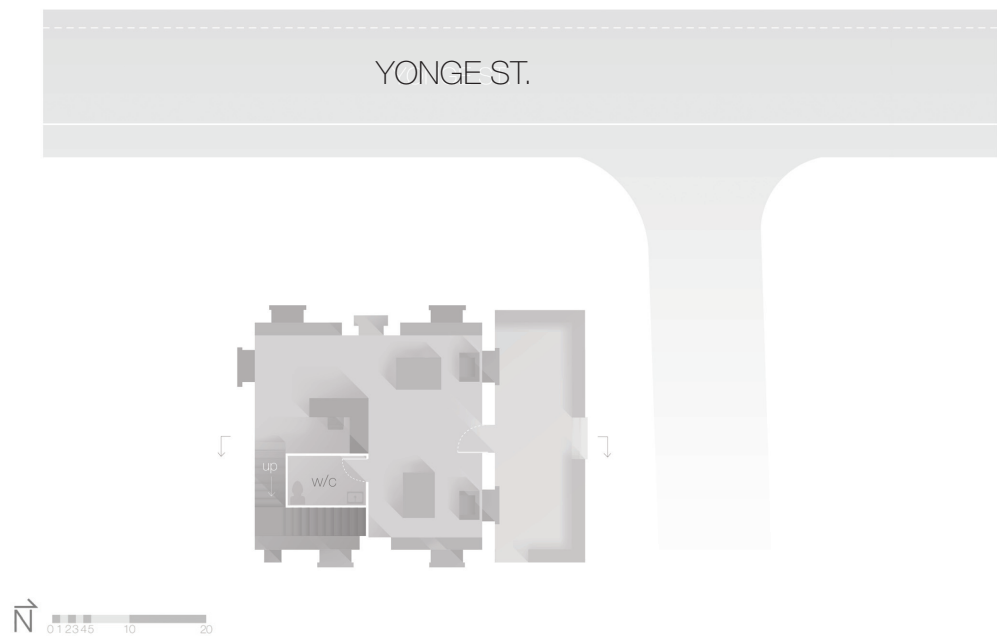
Ground floor plan of the trail centre, showing how the parent seed adapts to the cottage and forms into existing features such as window opening and fireplaces.
